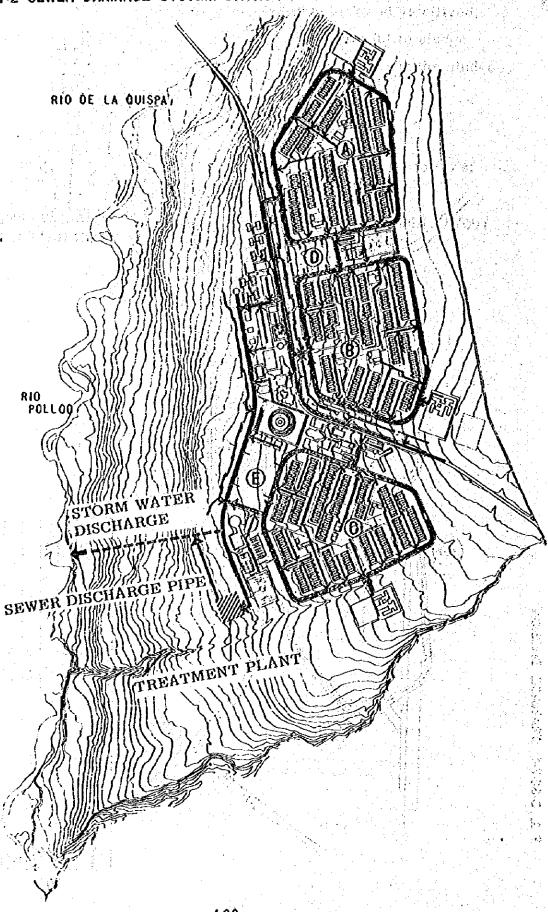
SEWER DRAINAGE SYSTEM DIVISION PLAN
